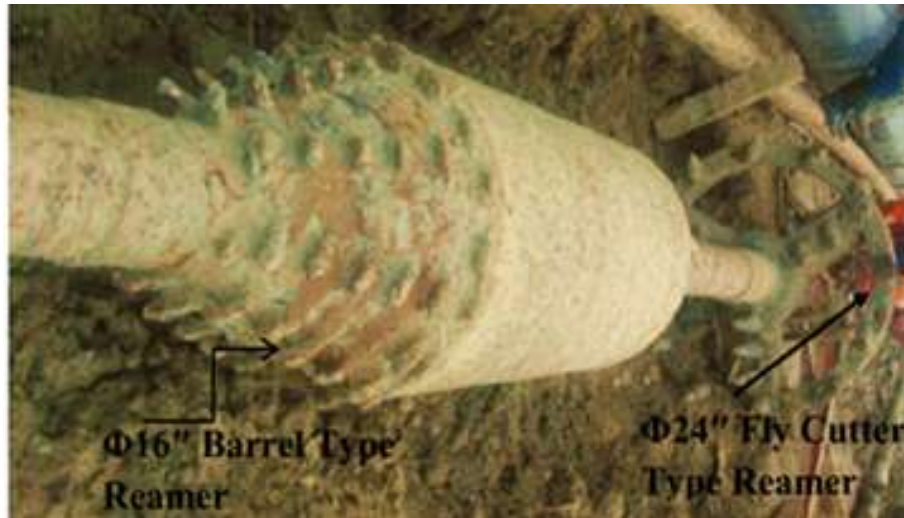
(a). Fly cutter and barrel type reamer assembly for 24\" reaming.
